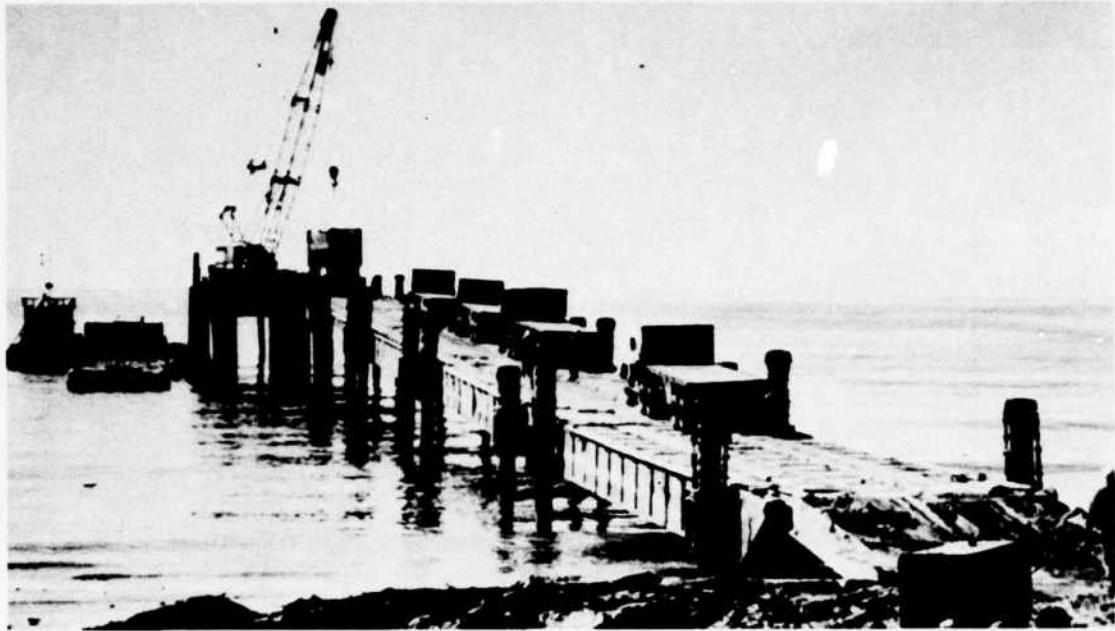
Unloading containers from three-section causeway ferry at elevated pierhead.
